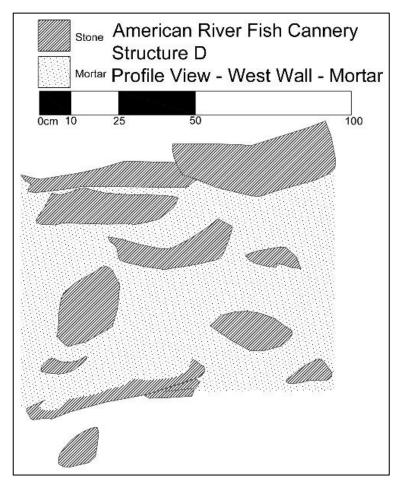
Illustration of western wall of Structure D, with a focus on stone and mortar layout.
